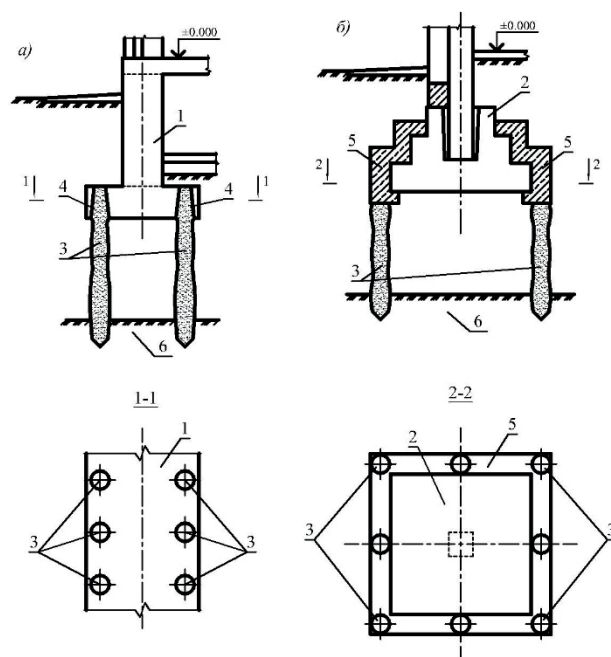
Foundations reinforced by injection (bored-injection) piles: a - under the bottom of the existing strip foundation; b - adjacent to the slab part of the existing separate foundation; 1 - existing strip foundation; 2 - existing separate foundation; 3 - injection (bored-injection) piles; 4 - cone hole in the slab part of the foundation; 5 - reinforced concrete cage; 6 - bearing layer of the foundation soil
